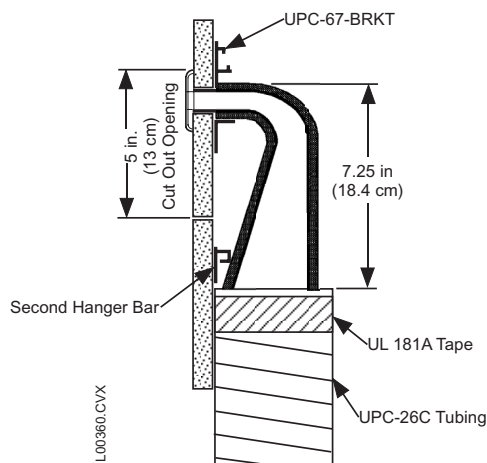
Existing Wall Cut-out Opening, 90° Outlet
